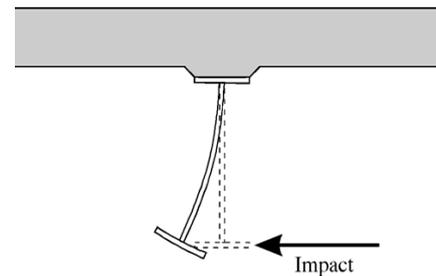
Impact Damage from Vehicle (Steel Girder)
